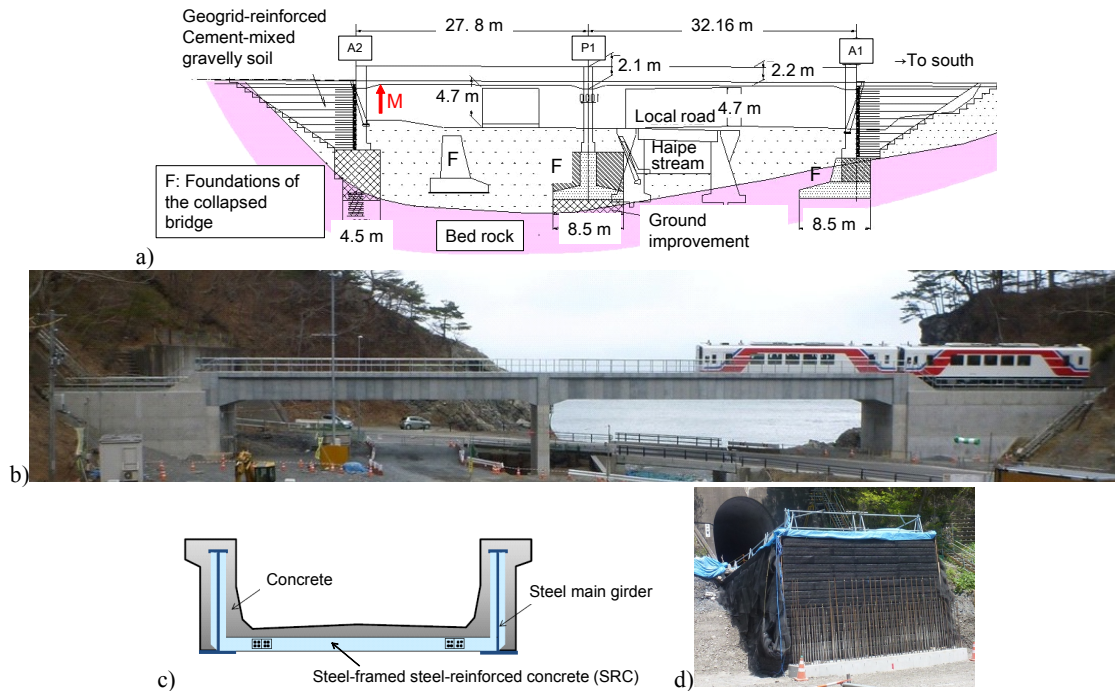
Haipe-sawa bridge, Sanriku Railway: a) structure of GRS integral bridge seen from the inland; b) completed GRS integral bridge (6th April 2014); c) typical cross-section of the through girder; and d) the north abutment immediately before constructing FHR facing (22 May 2013)
